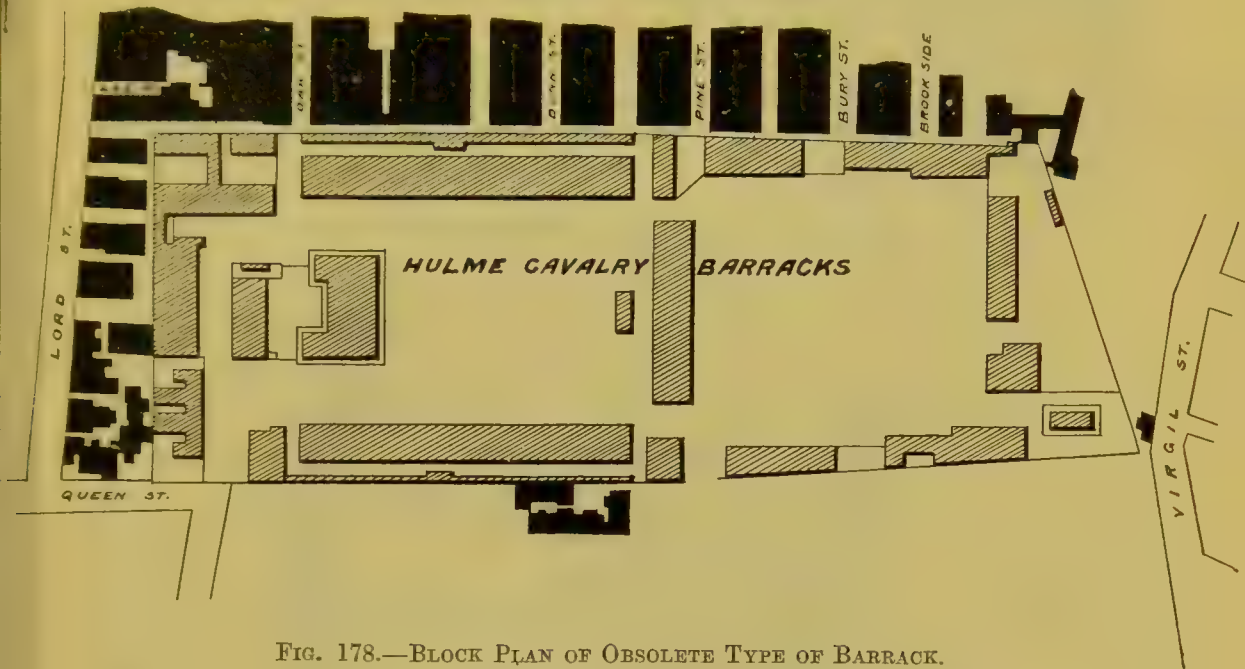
BLOCK PLAN OF OBSOLETE TYPE OF BARRACK.
